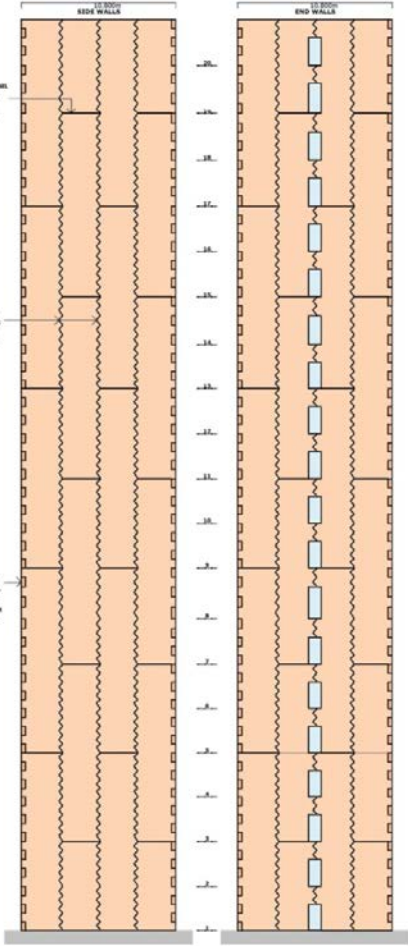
Twenty level Integrated Panel Core - Side and End Elevations
